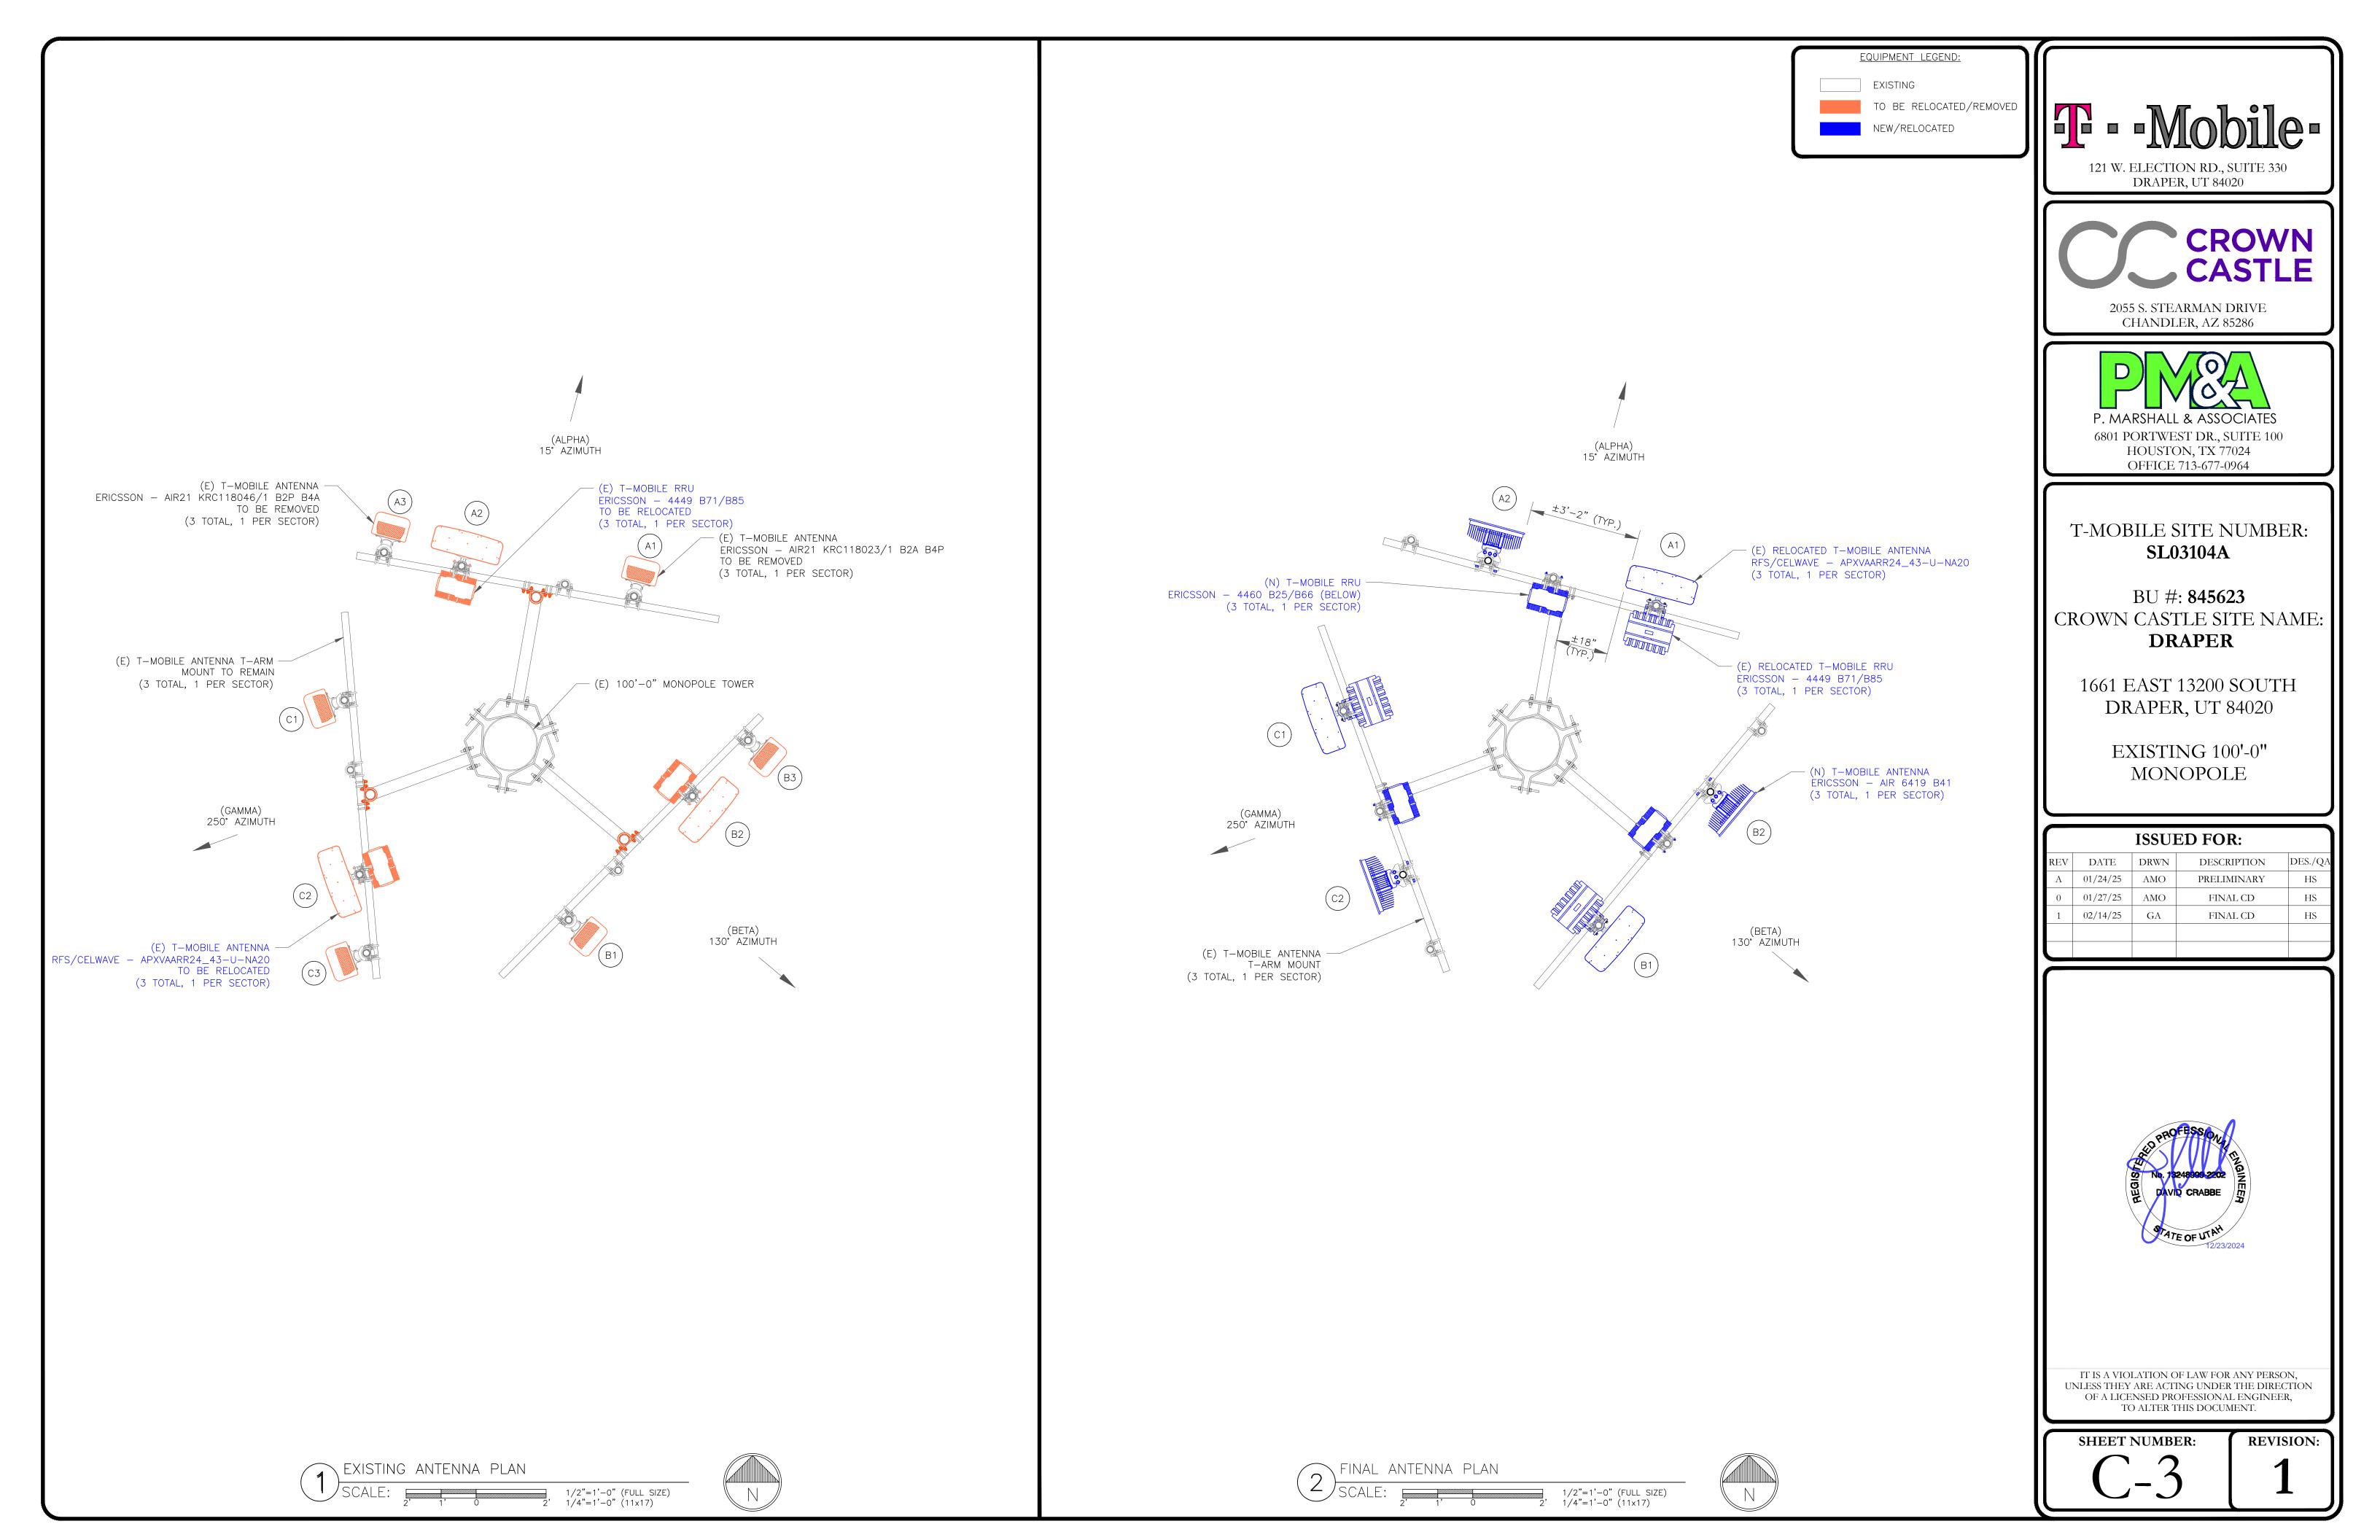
EXHIBIT G EQUIPMENT LAYOUT AND ELEVATIONS
